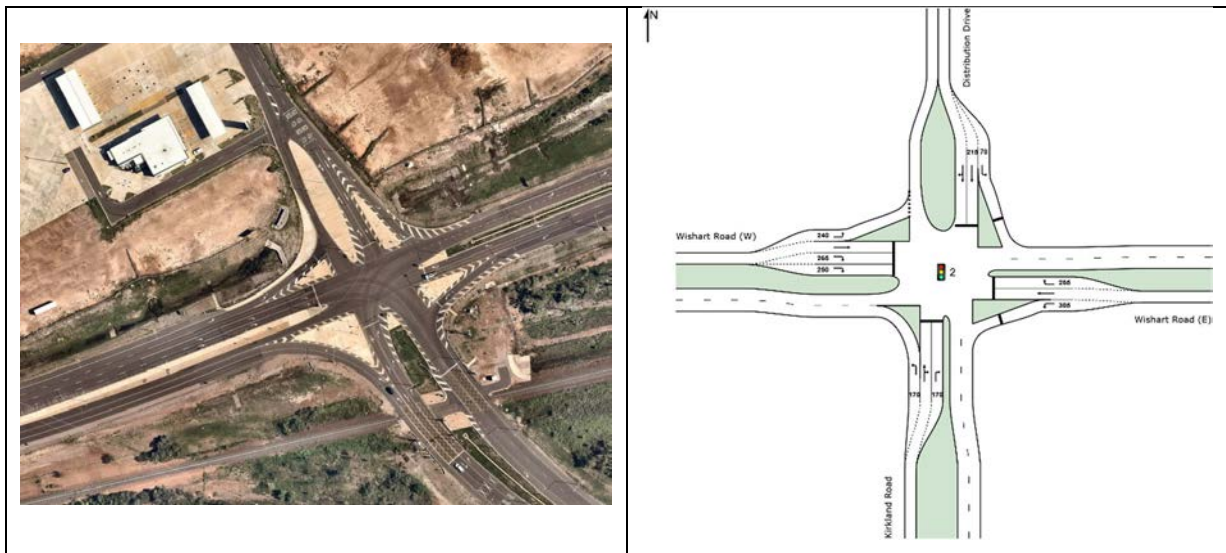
Wishart Road / Kirkland Road intersection – Aerial view and SIDRA layout
